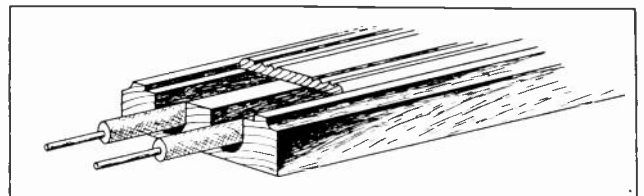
A piece of wood moulding of the type sometimes used in making additions to old systems of this type.
